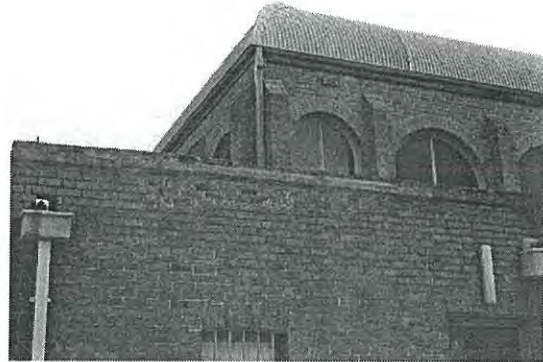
Exterior, Exchange Hall, detail of poor quality re-rendering to parapet capping, east elevation, south end.
